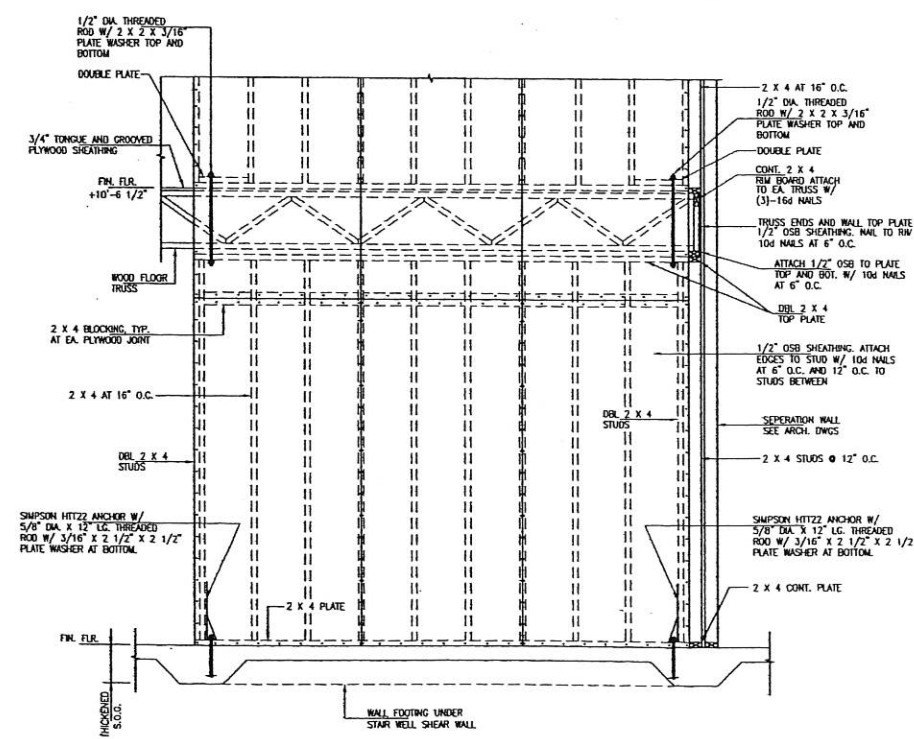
DETAIL - B Floor Truss Bearing @ Separation Wall, typ.
